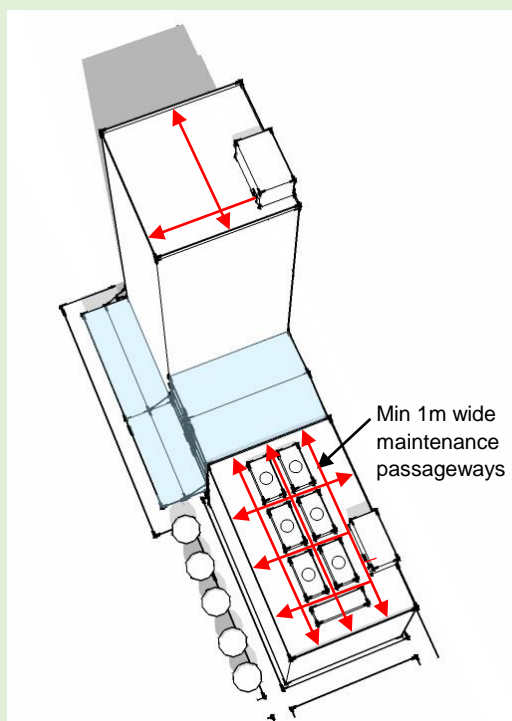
Provide 1m wide unobstructed maintenance passageway
